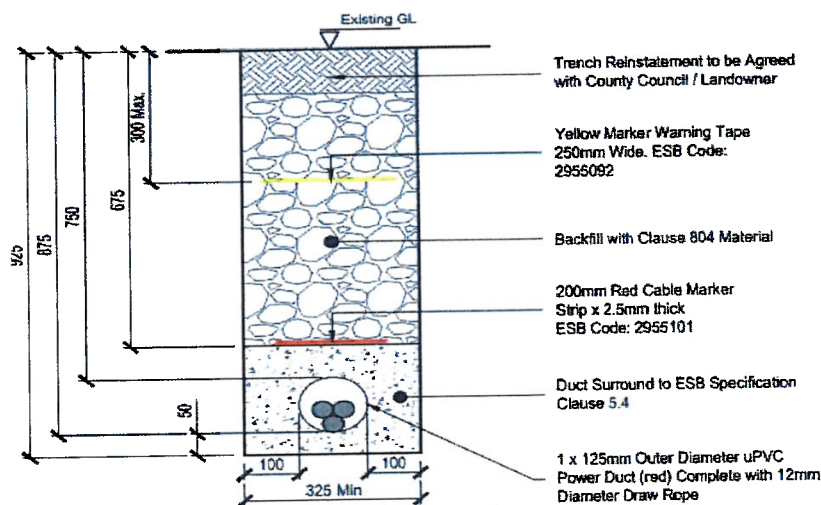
Standard 20kv Trench Detail in a Private Road (SPEC-231213-AXUU)
